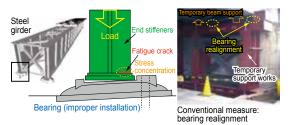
Fatigue cracks at the lower end of the edge stiffener and conventional countermeasures
